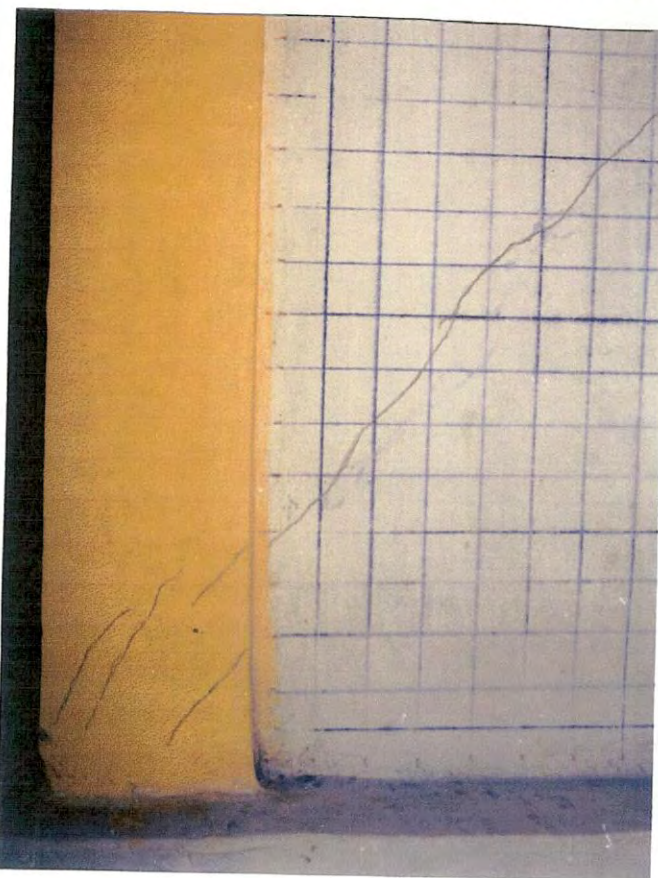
The close up view of crack through the masonry infill.
